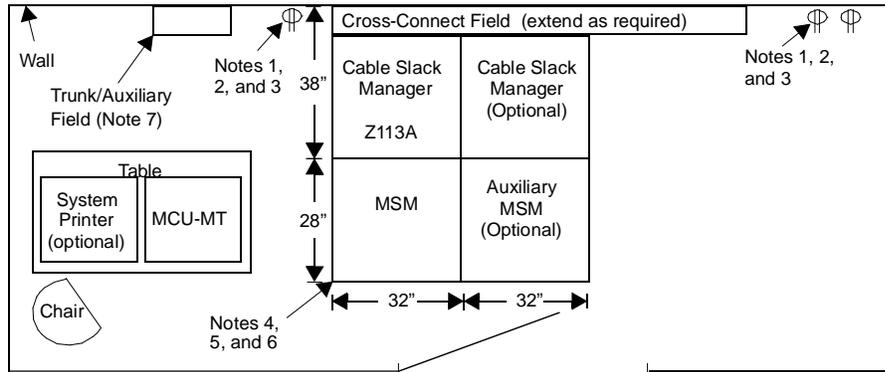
Typical Floor Plan for AC-Powered MCU with Single Carrier MSM
